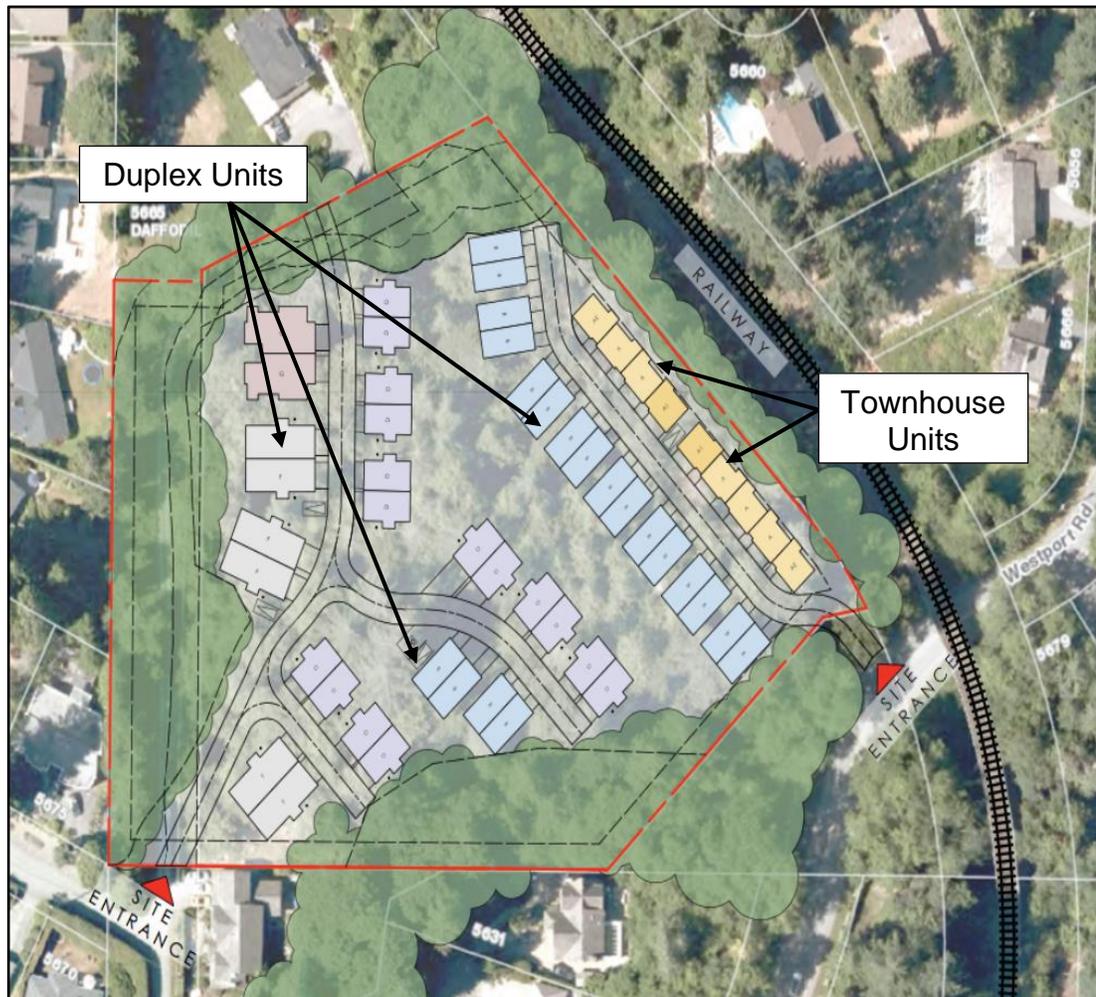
Preliminary Site Plan (site shown with dashed outline)
